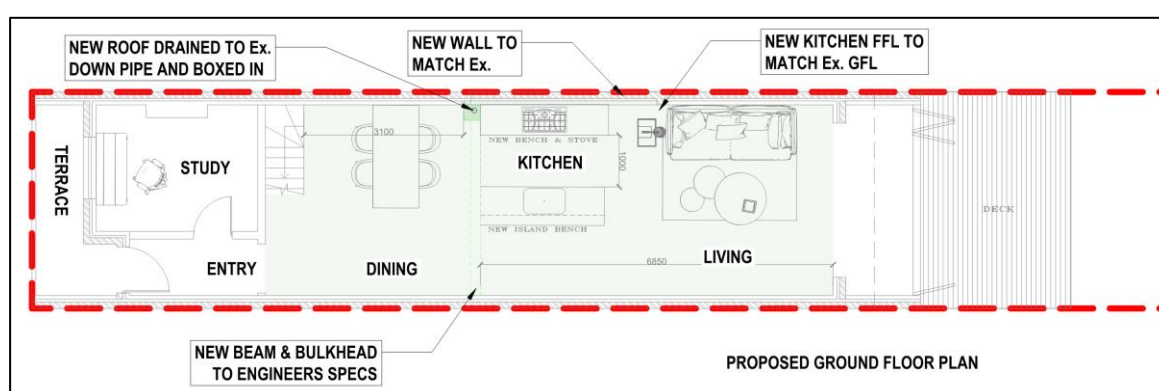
Proposed ground floor plan – 19 Oswald Street, Randwick
